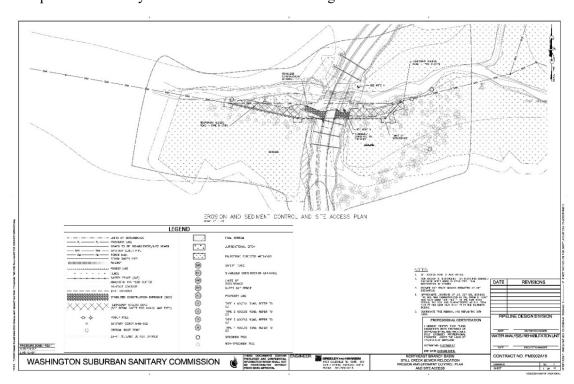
, Alternative 2: Site Plan for Proposed Sewer line Relocation.
